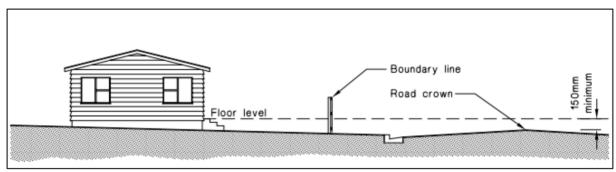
Minimum Floor Level for Site Above Road (Figure 1 Acceptable Solution E1/AS1)
